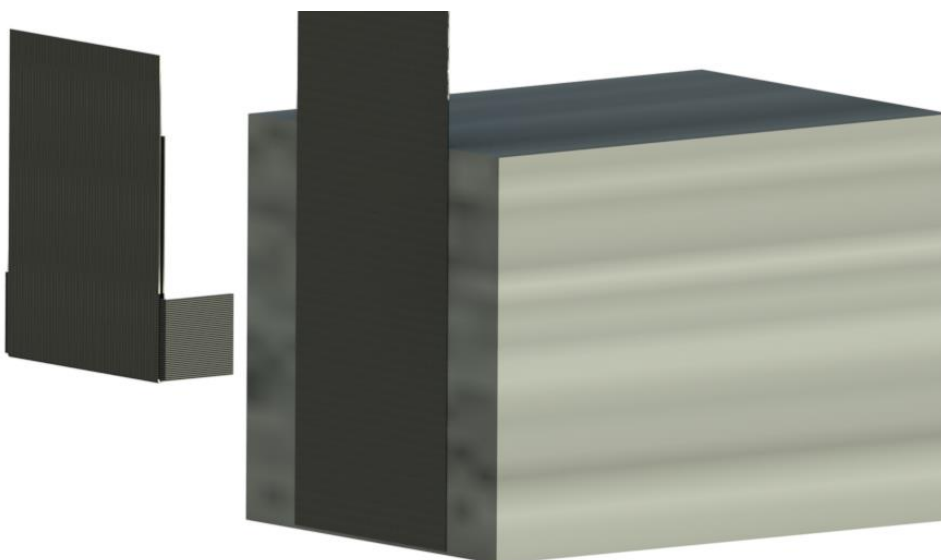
3D view of Concrete block + CFRP Sheet + Flat Staple Anchor + CFRP Patch
